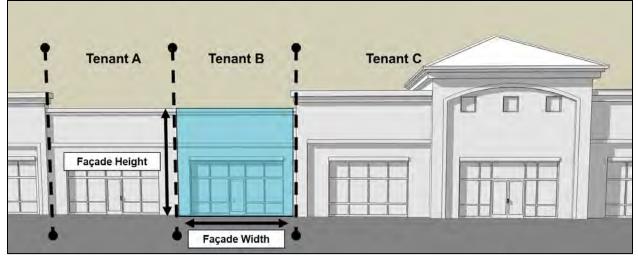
Facade Area Calculation for Multiple-Tenant Building
